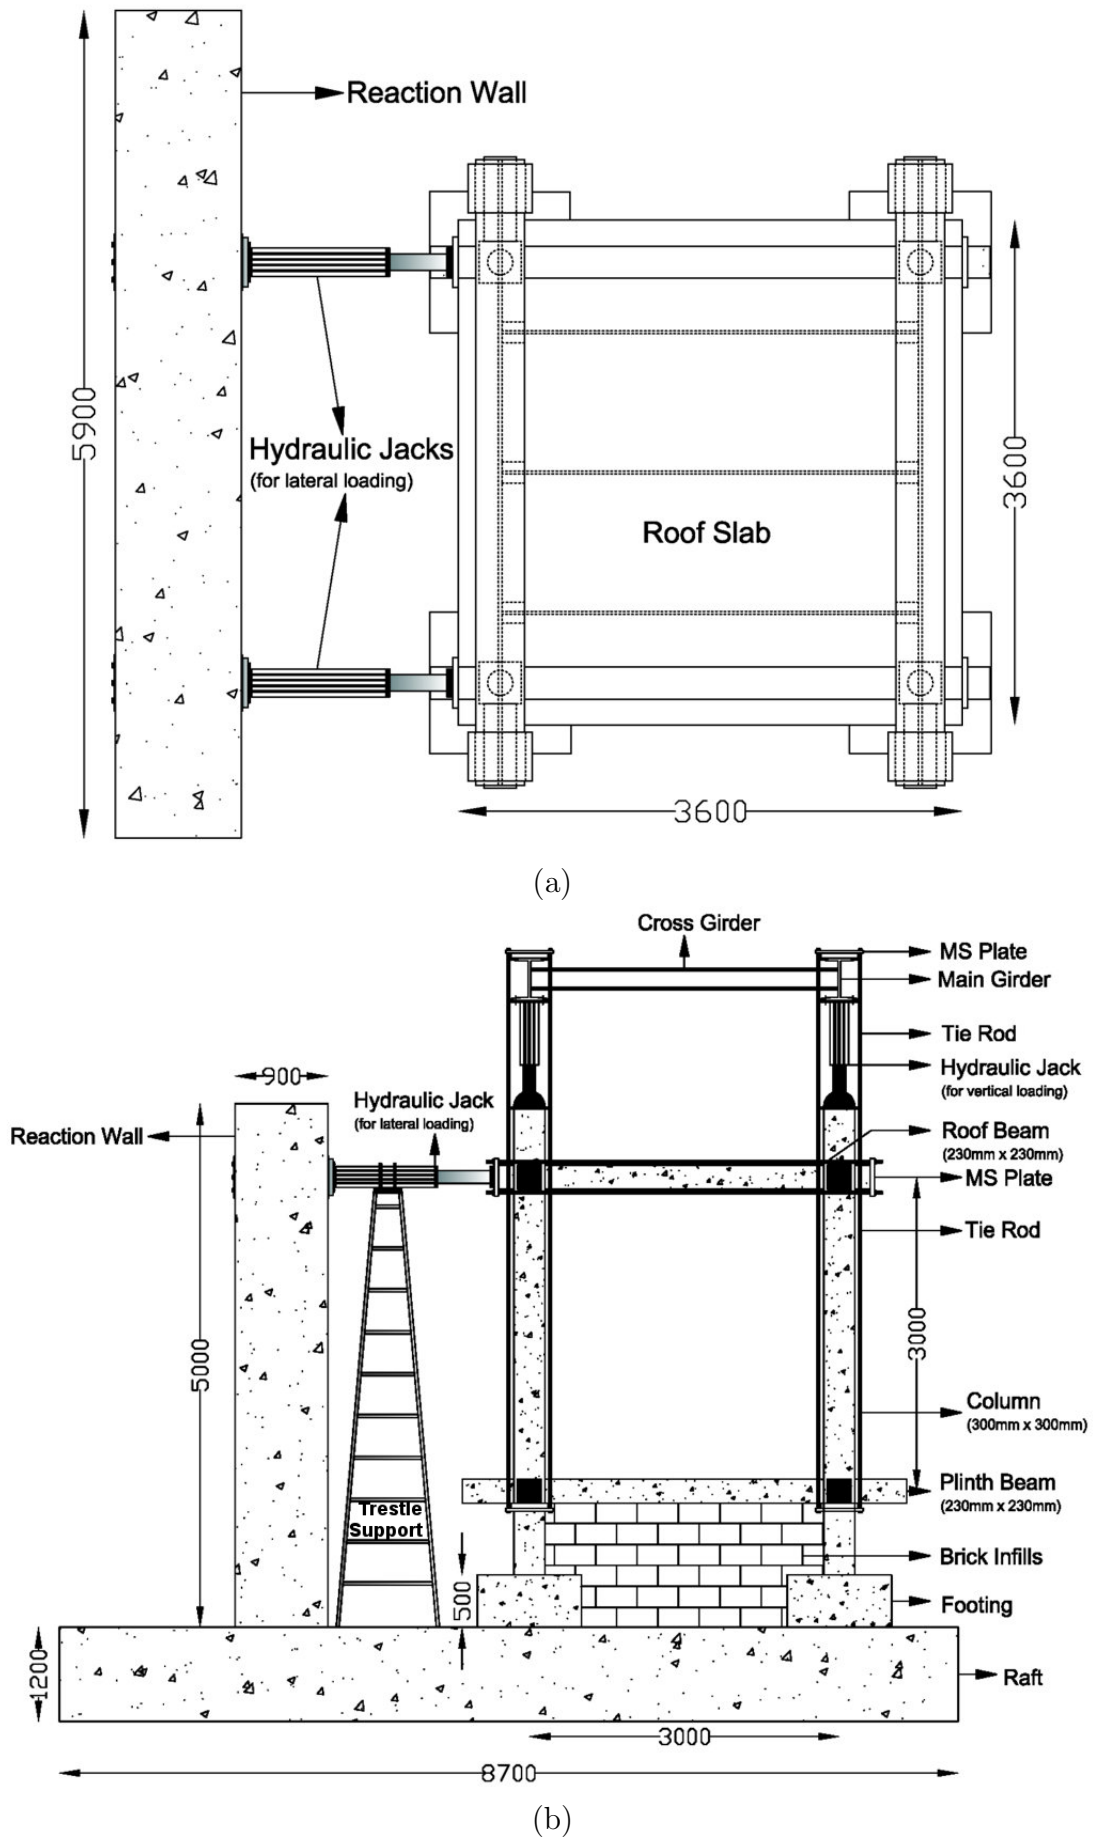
Schematic diagram of the test setup (a)Plan (b)Elevation
